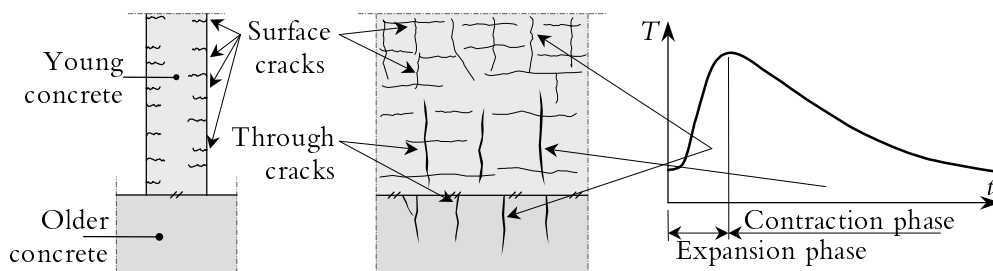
Examples of early age expansion cracks and contraction through cracks in a symmetrical wall cast on older concrete, Bernander (1982).
